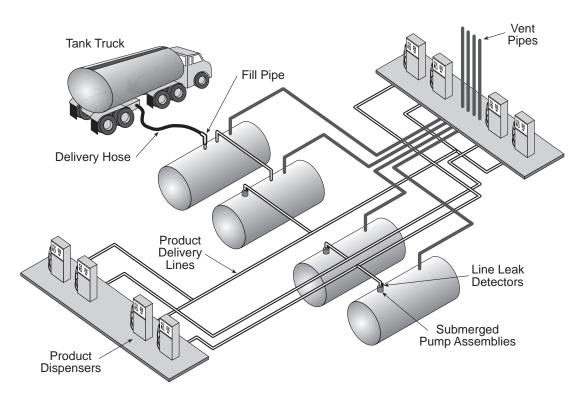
A Typical Retail Service Station with Pressurized Piping System
